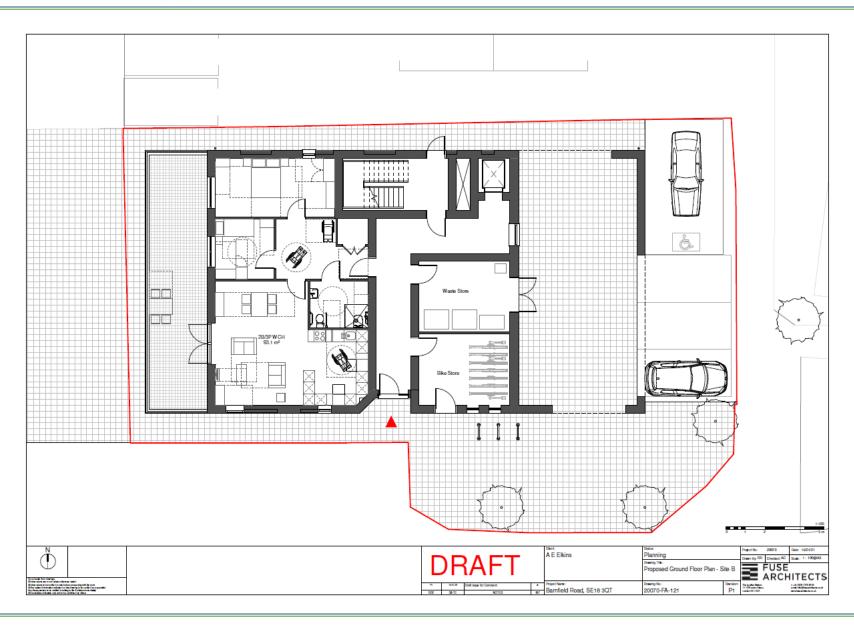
Site B Proposed ground floor plan (Reproduced by courtesy of the client)
